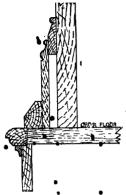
Section of Curb and Base Moulds of Pulpit on Church Floor.
